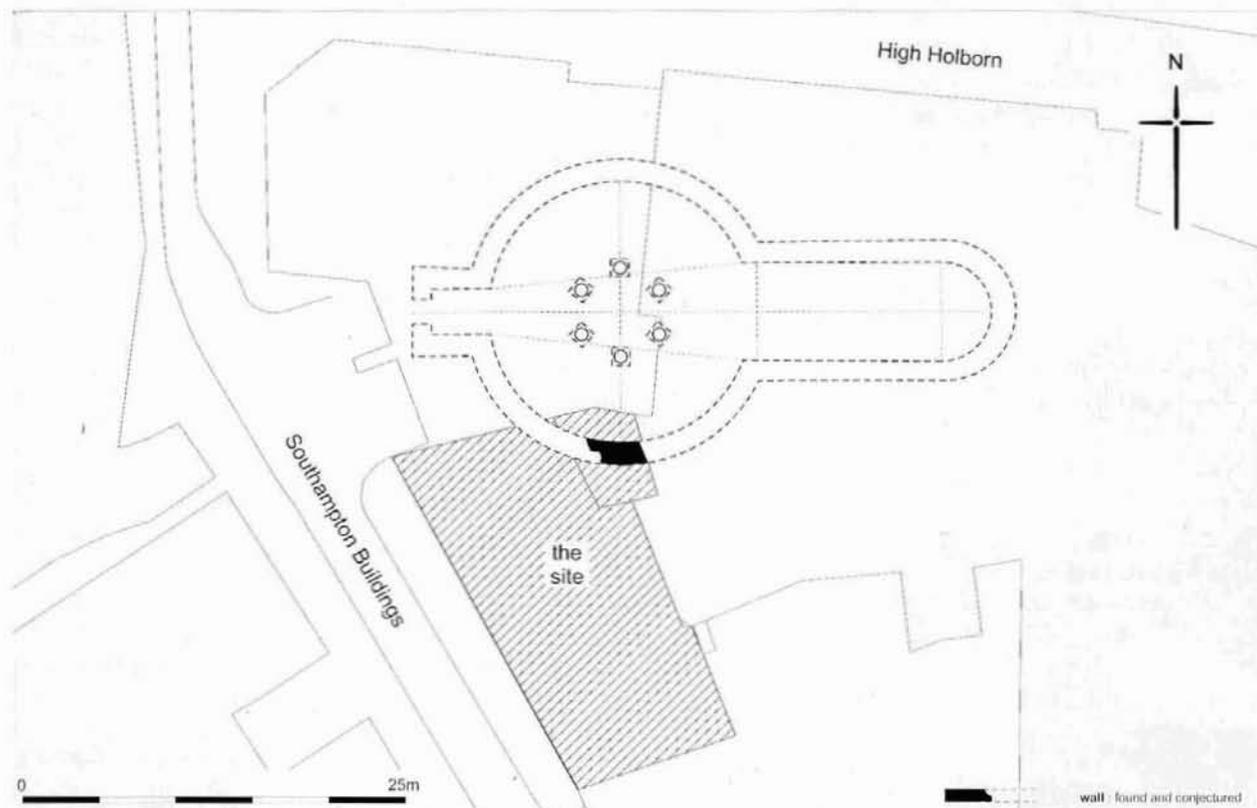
plan showing recorded segment of wall foundation in area of light well with projected outlines of porch, nave and chancel
